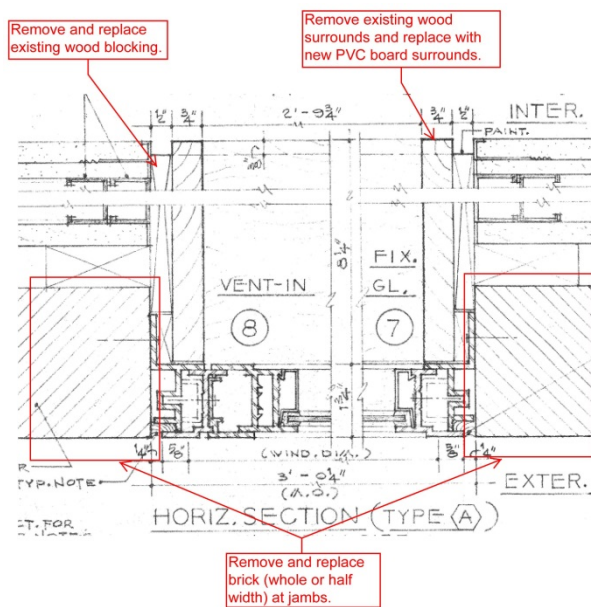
Horizontal details at Type 'A/A1' windows indicating PCB Remediation Wastes to be removed. [From 1968 Drawing A-20]
